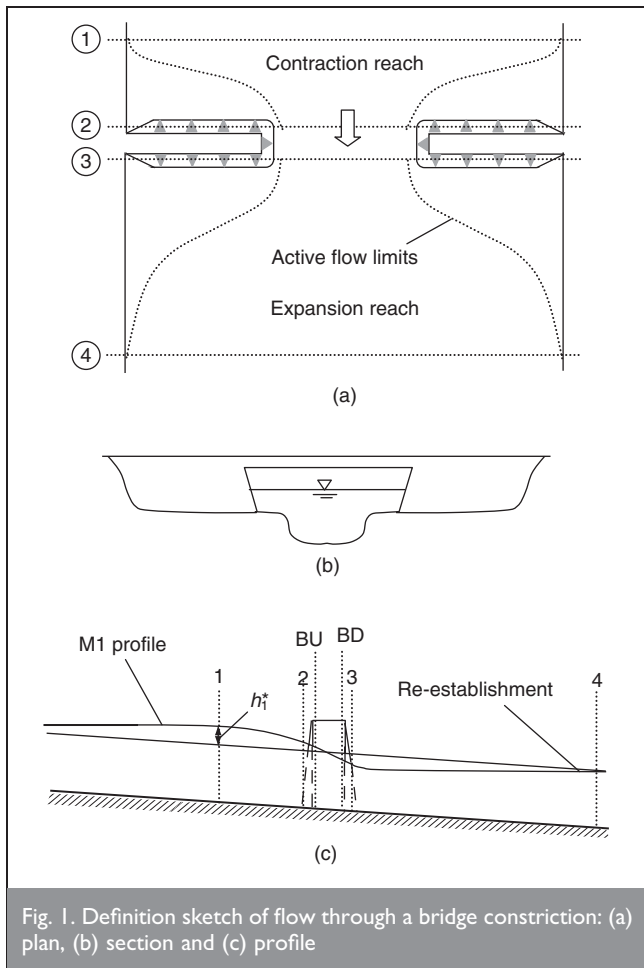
Definition sketch of flow through a bridge constriction: (a) plan, (b) section and (c) profile
